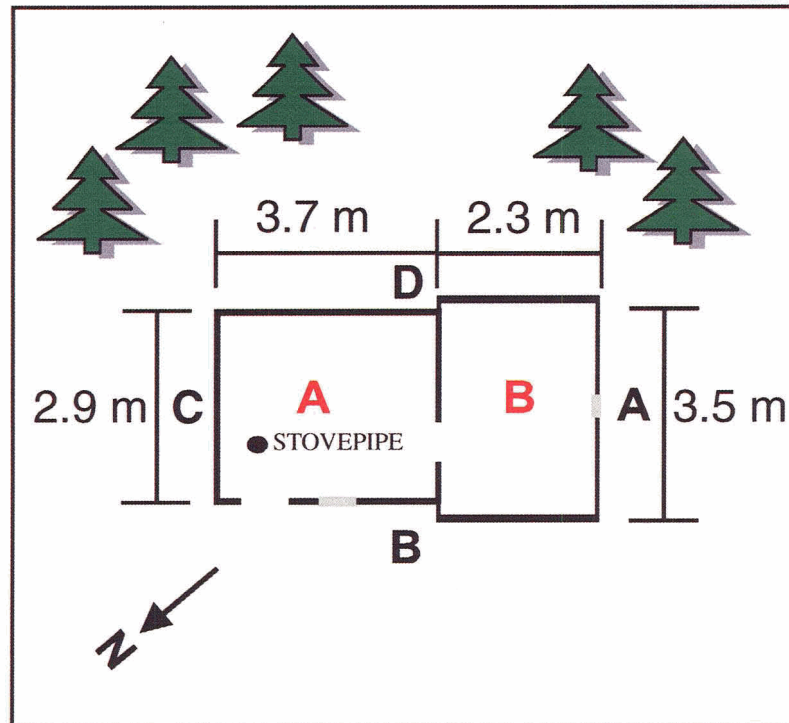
Billy Carver Cabin dimensional drawing.
